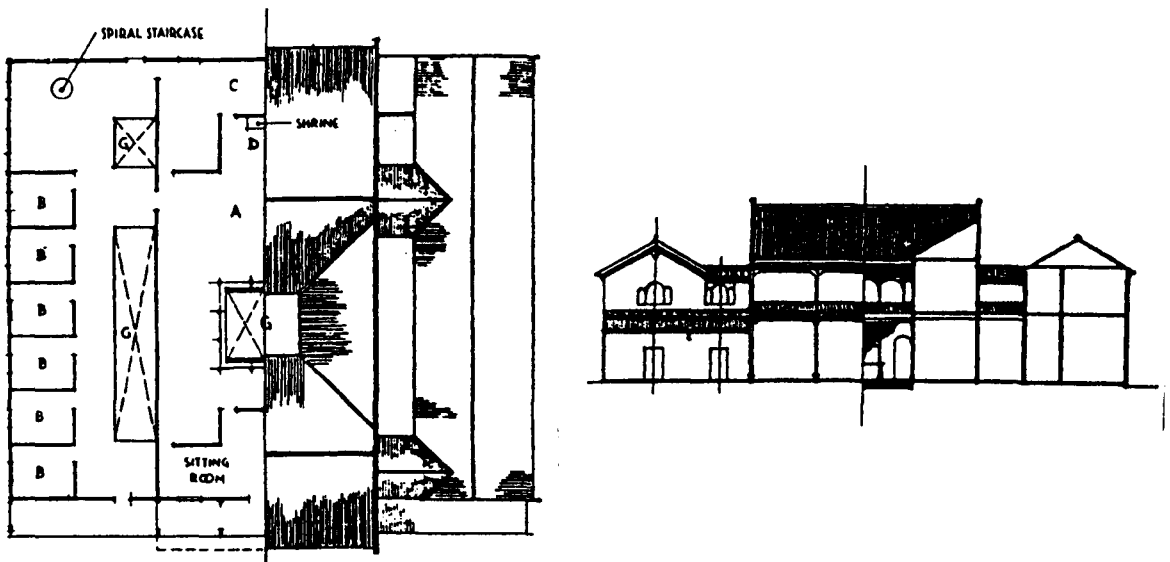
Sectional plan and elevation of Thio Tiau Siat mansion in Penang (1881).*⁶¹
